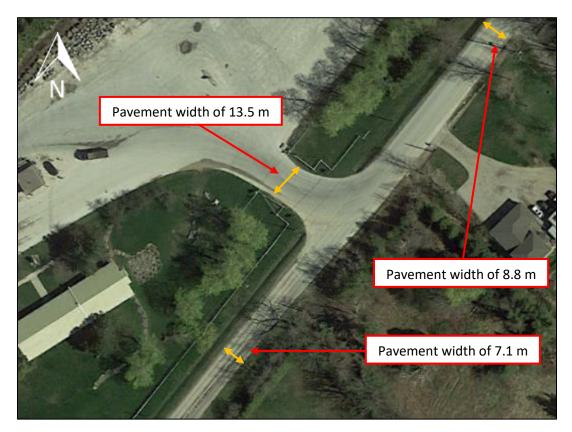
Pavement widths around the existing truck entrance (© Google, 2018)
